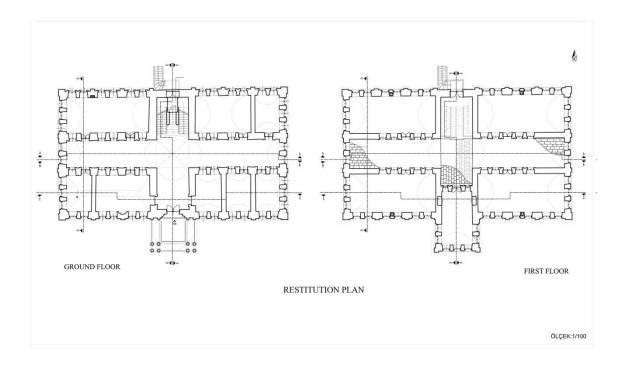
Rüşdiyye School. Plan of first and second floors (From: Mardin Government Archive).
